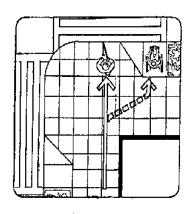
Undesirable Placement of Adjacent Curb Ramps Too Close Together
